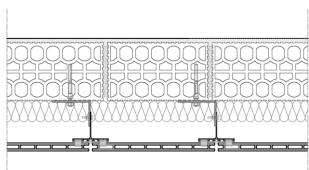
Horizontal section. Faveton® SAH Acqua 20-V.
